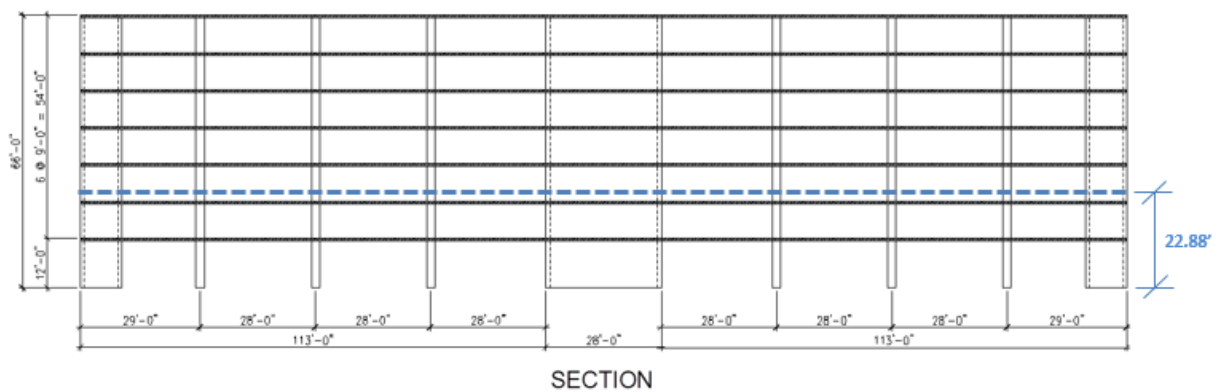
7 Story Residential Building using Special Reinforced Concrete Shear Walls and posttensioned flat slab supported on gravity columns
